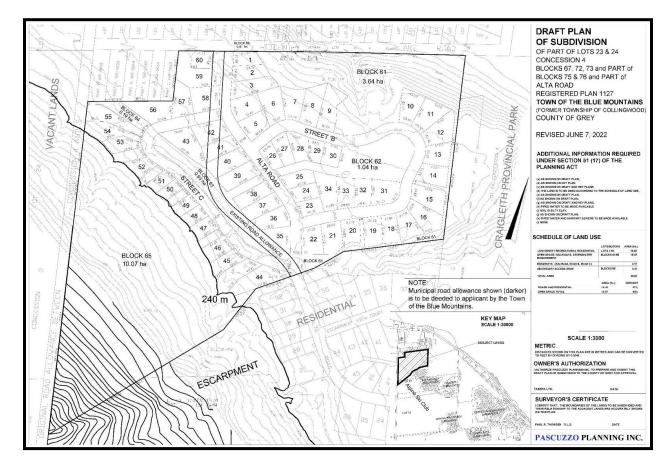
Draft Plan Approved Plan of Subdivision (Alta Phase 2)
